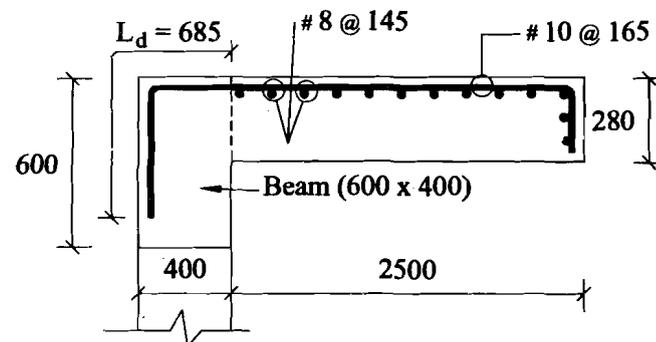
Details of Reinforcement of Cantilever Slab Designed
